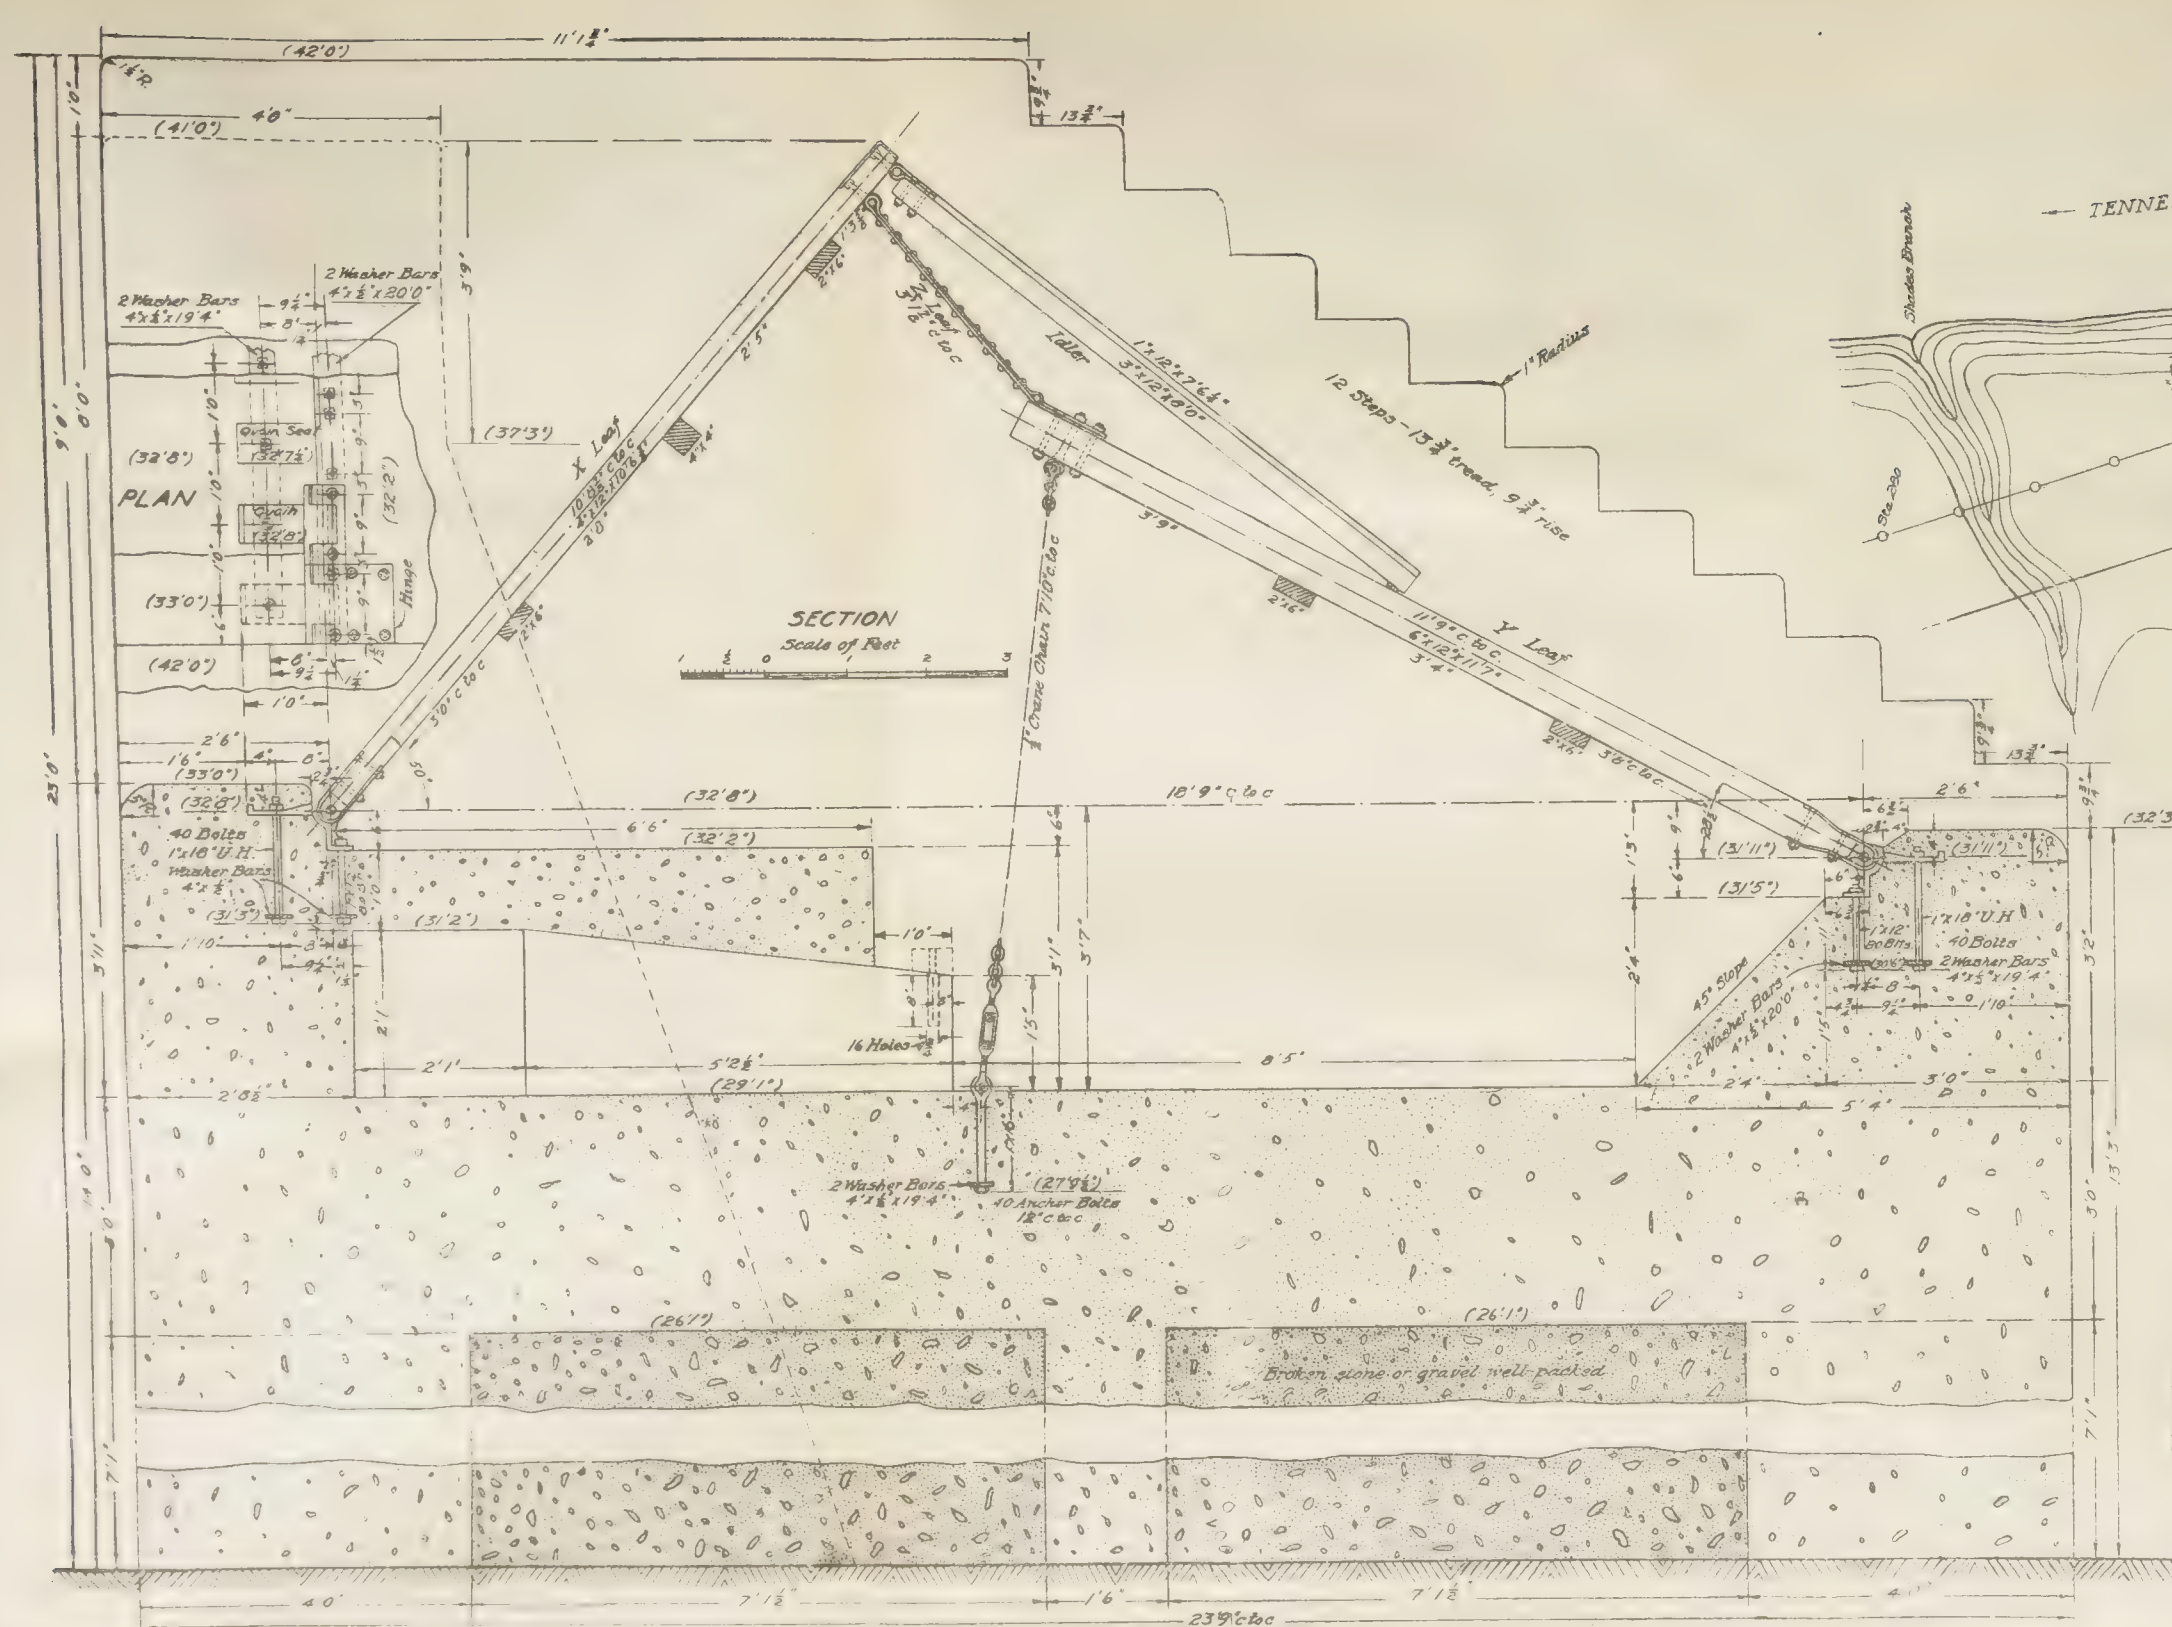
Bear-trap drift sluice in lower end of concrete wall, looking across canal into the river.
